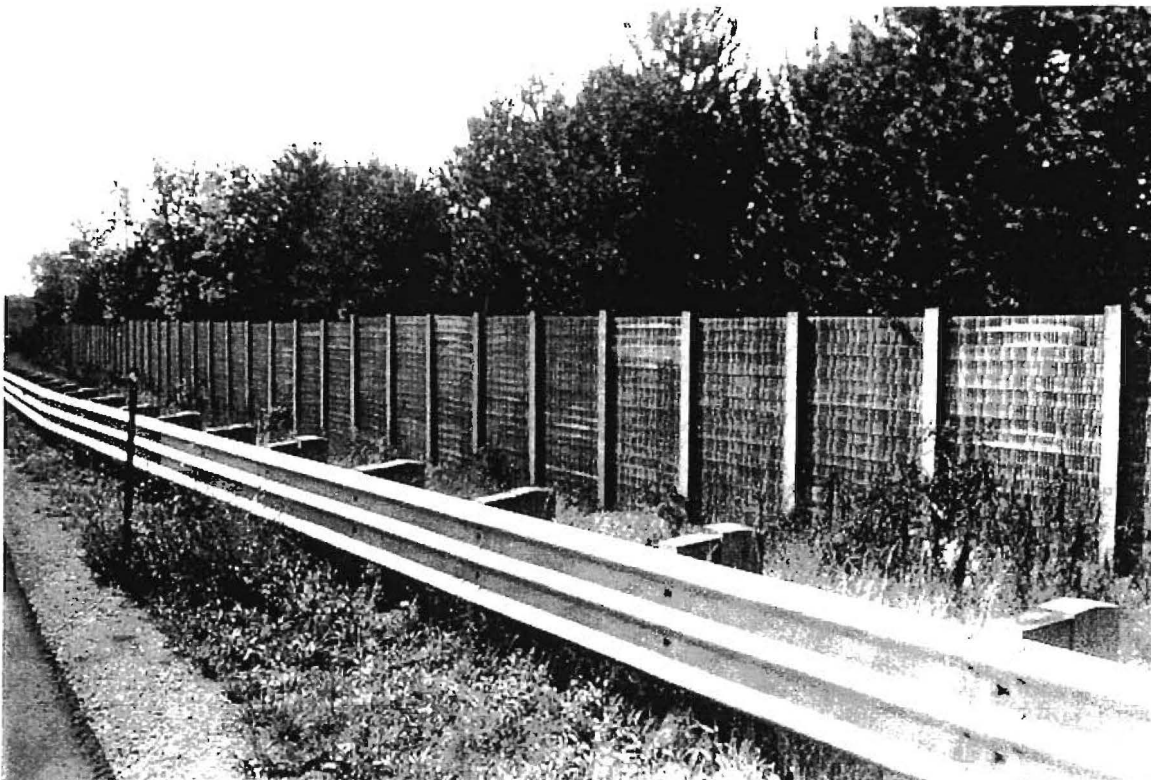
Precast Concrete with 203.2 mm (8 in.) Thick Panels and 2.44 m (8ft.) Post Spacing (Michigan DOT)
